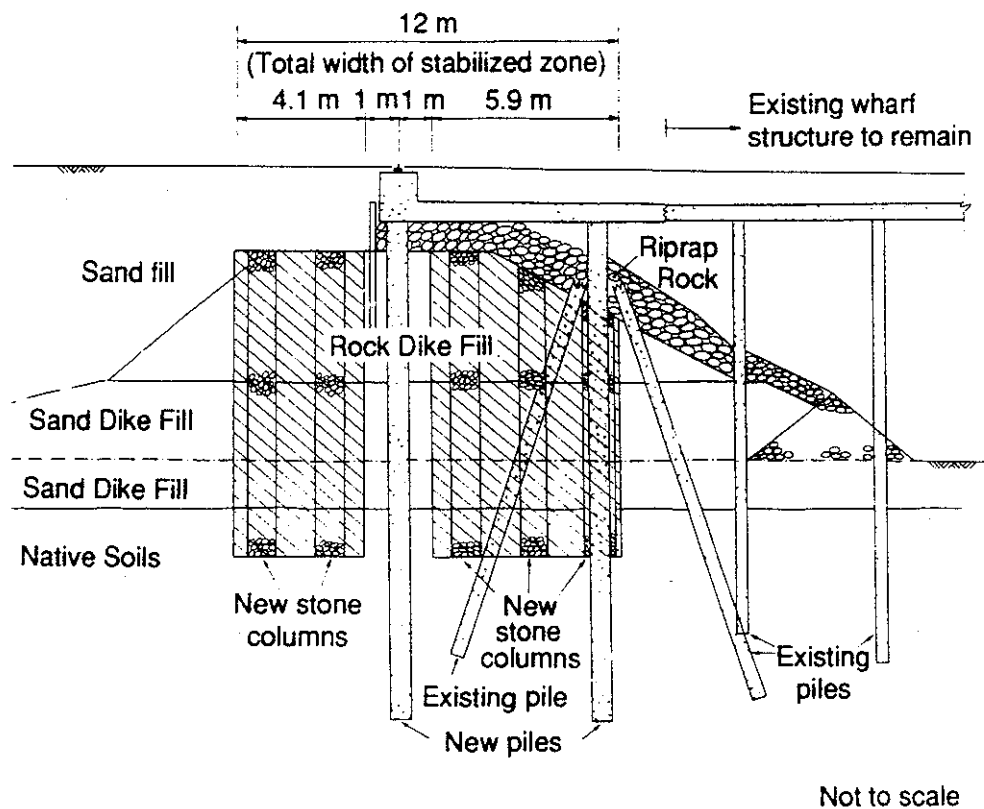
Stone Column and New Piling Configuration for Seismic Repair at Seventh Street Marine Terminal (Egan et al. 1992)
